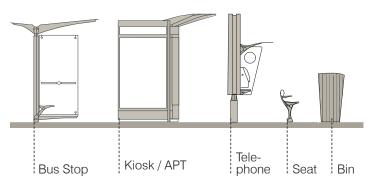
Village Centre and Activity Strips Streetscape Character Plan
